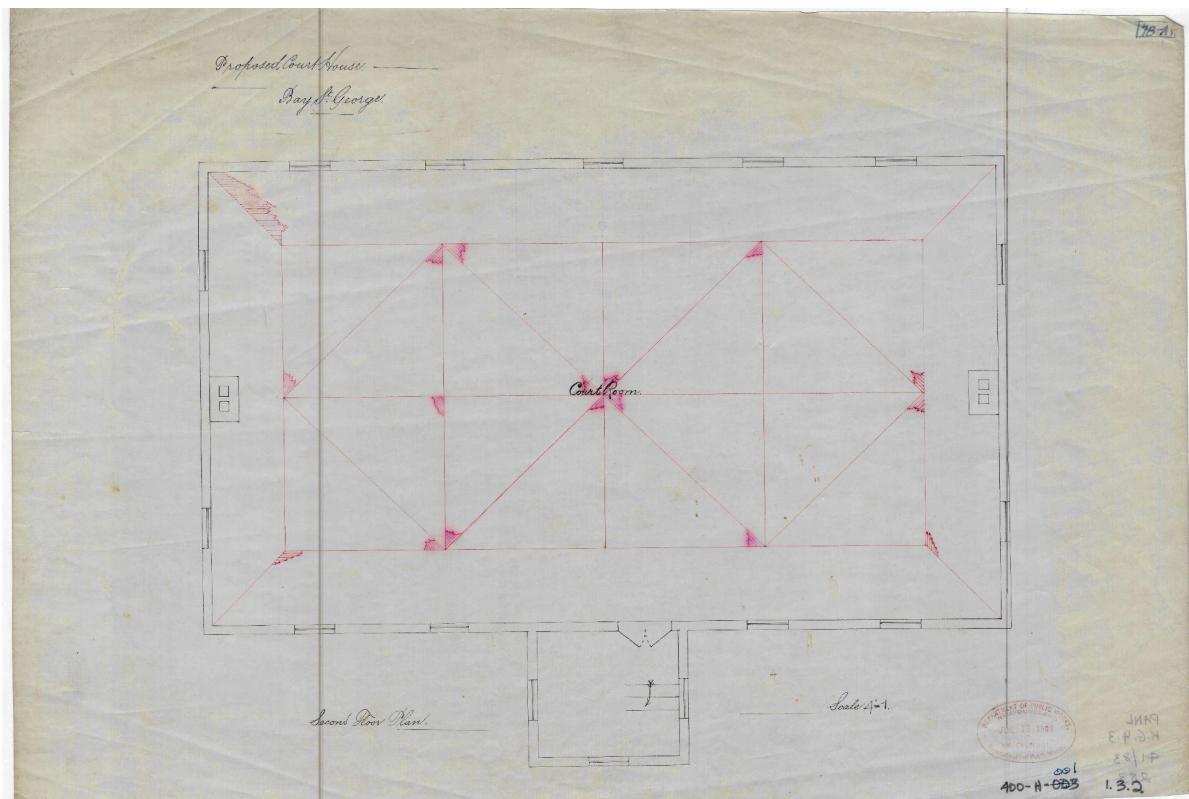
Building plan of second floor courtroom (Provided by The Rooms Archive)
